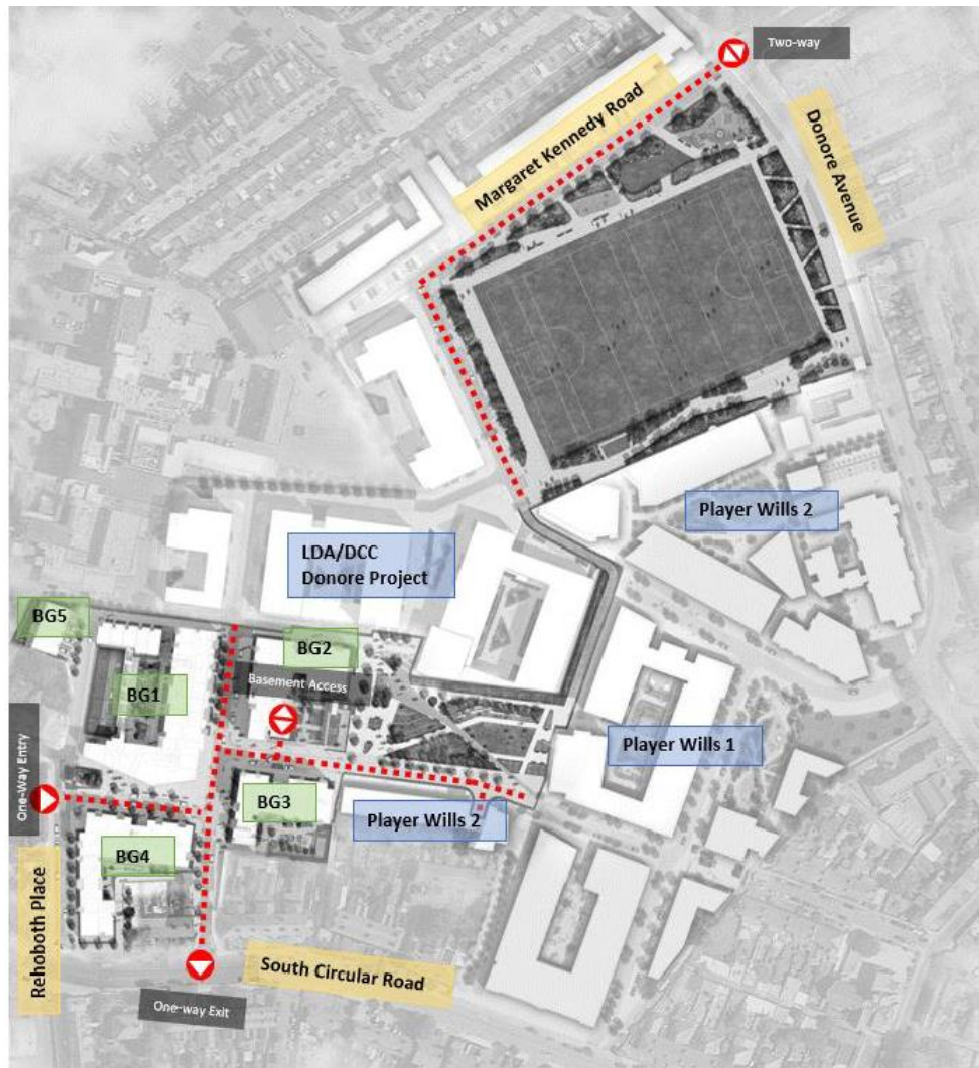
PROPOSED SITE WIDE VEHICULAR ACCESS
